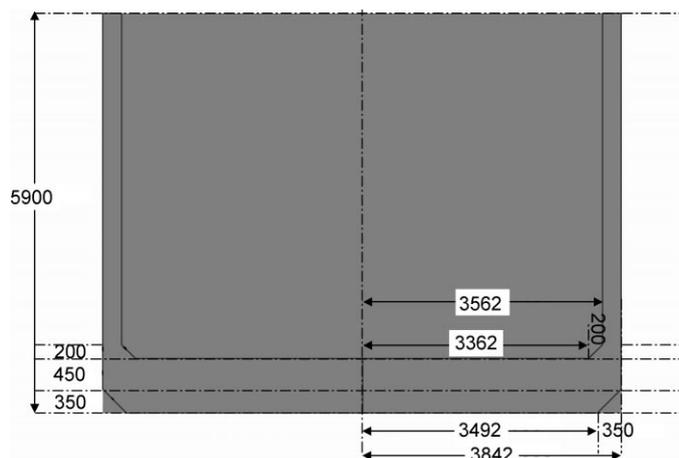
Shape and scale of a LNG tank (Axial section, unit: cm)
